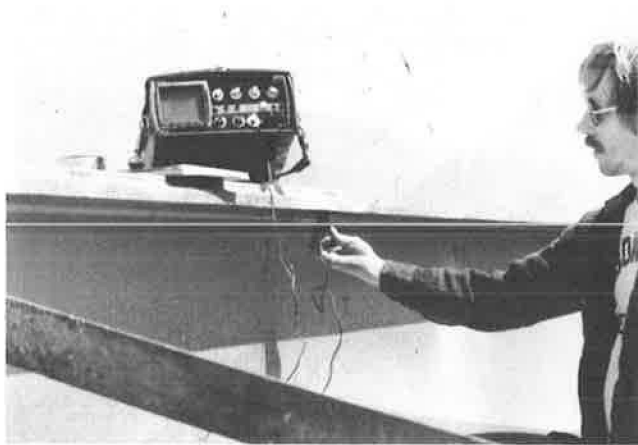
Inspection at end of welded cover plate: ultrasound instrumentation.
